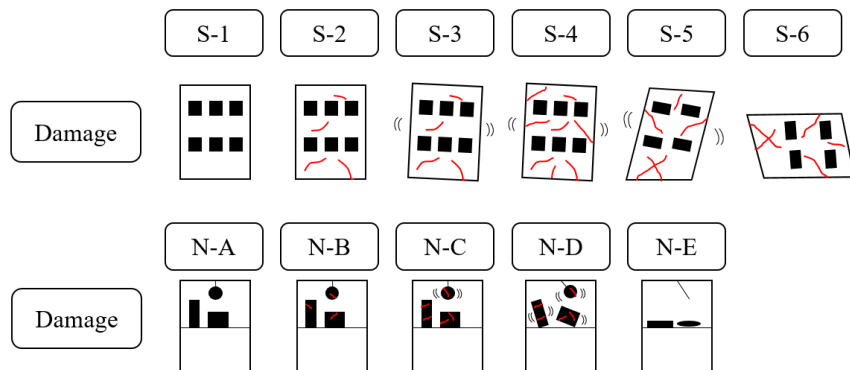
ASCE 41-17 new damage level for structural & non-structural components
